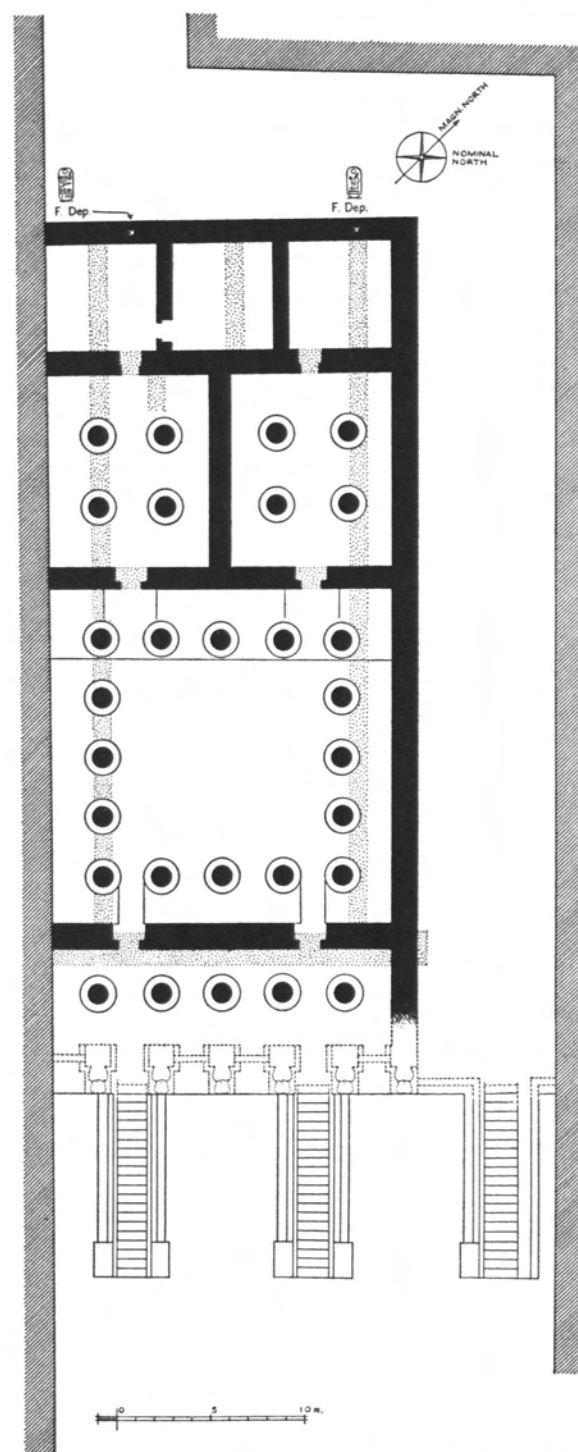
GROUND PLAN OF THE SMALL DOUBLE TEMPLE OF SETI I AS REBUILT BY RAMSES II. RECONSTRUCTION. SCALE, 1:400
